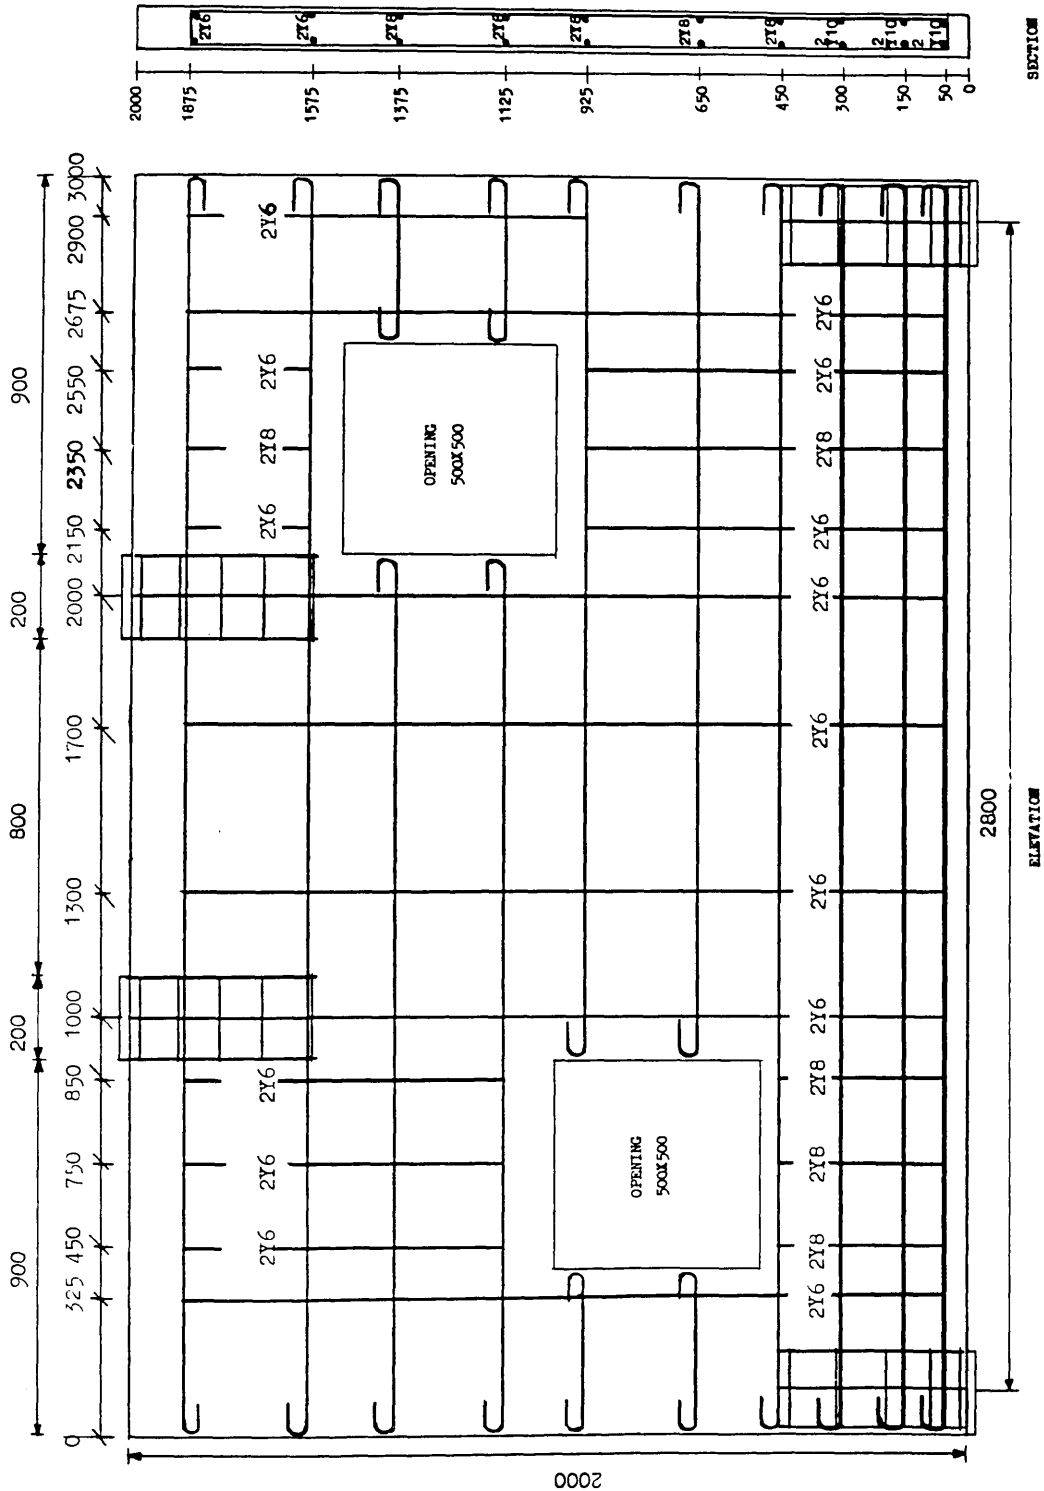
Dimensions and reinforcing details of girder TRGRAS6
